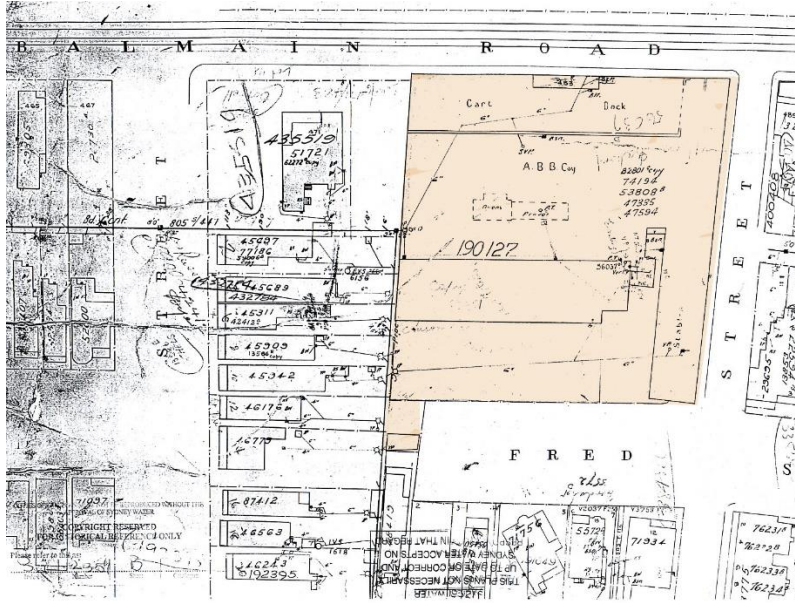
Drainage plan showing an outline of the buildings on the site. (Source: Sydney Water)
